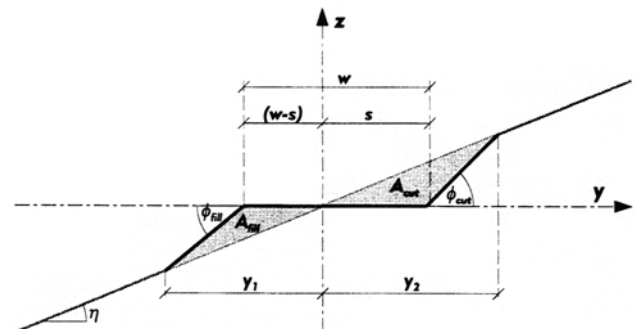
Structural model of road cross-section. Geotechnical engineering deals with three system components: (1) embankment, (2) pavement, and (3) earth-retaining structures.
